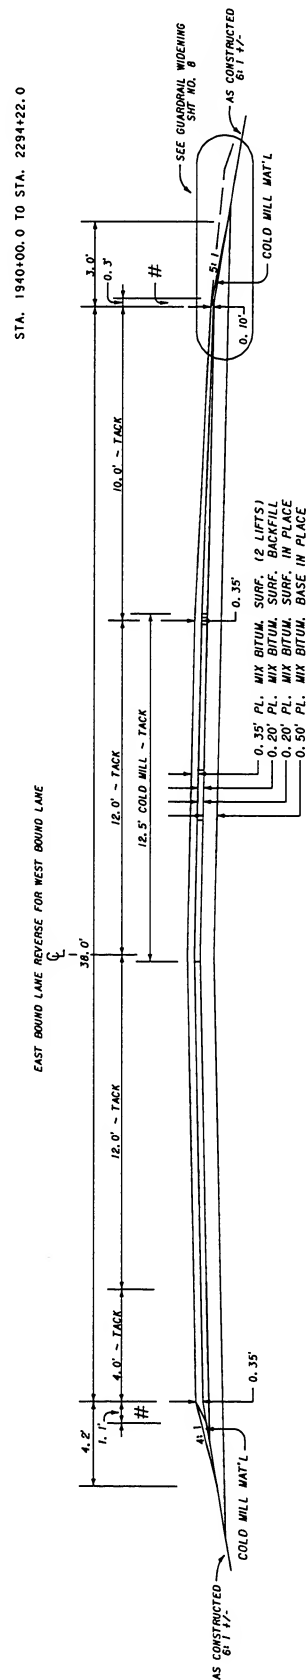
Layout of Test Sections - Interstate Highway I-94.
